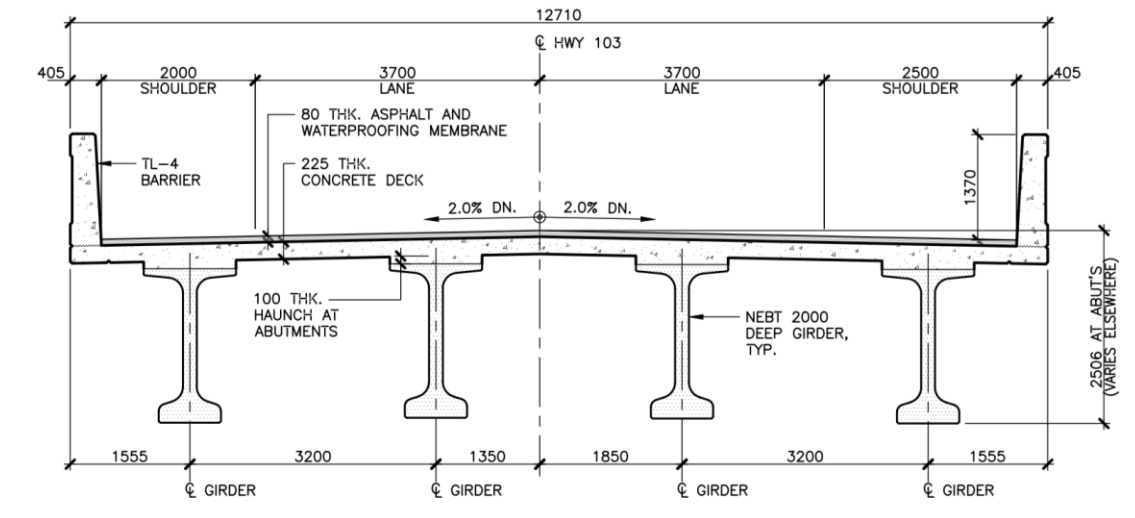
Cross-section of bridge analysed using finite element (FE) extracted from bridge drawings provided by NS-PW (all dimensions in millimeters).
